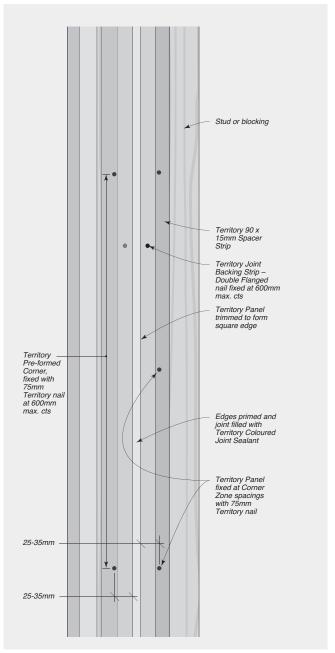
Typical Face Nailing at Square Edge Joint - Elevation
